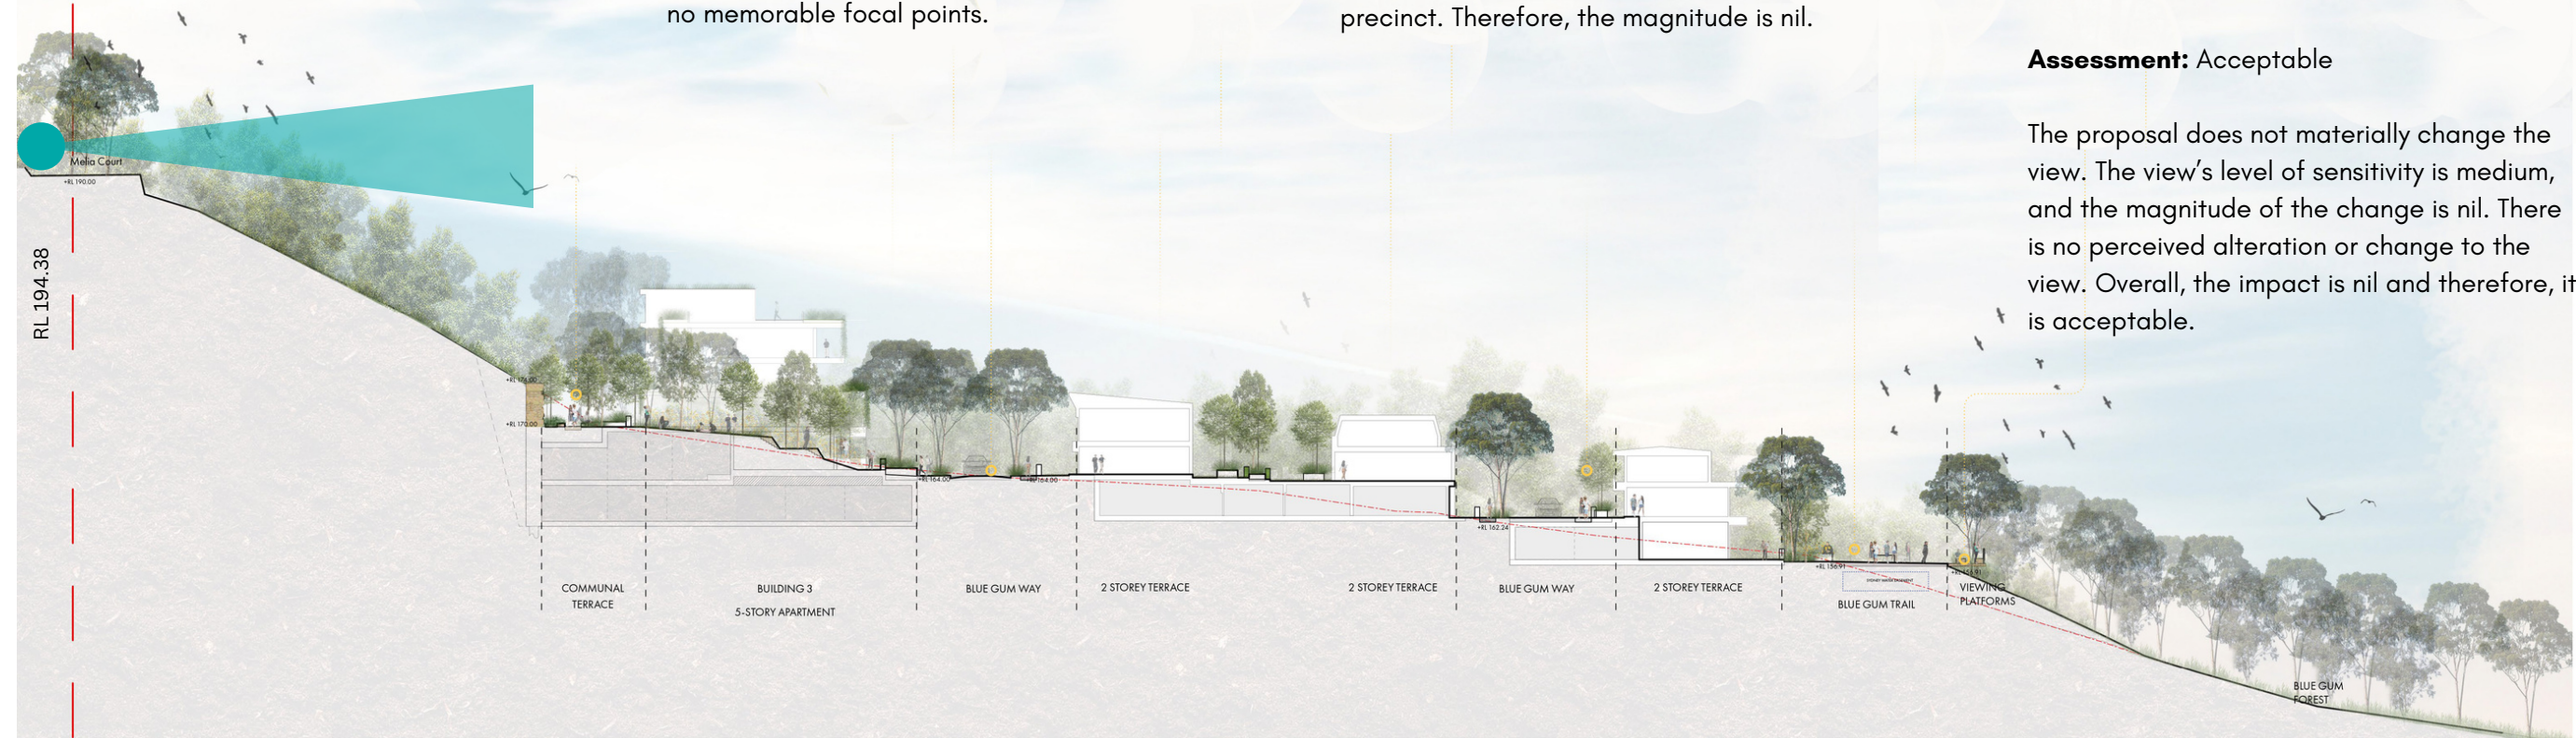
View Location relative to site's topographical level – Adapted from Landscape Architectural Planning Proposal Report – Courtesy of Land And Form
